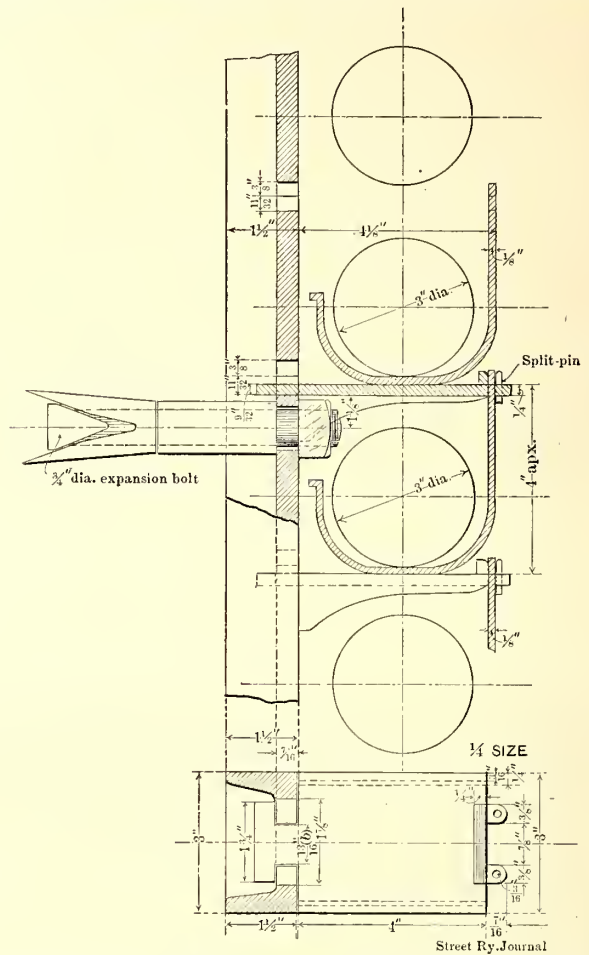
SHOWING METHOD OF SUPPORTING CABLES IN TUNNEL WALLS
